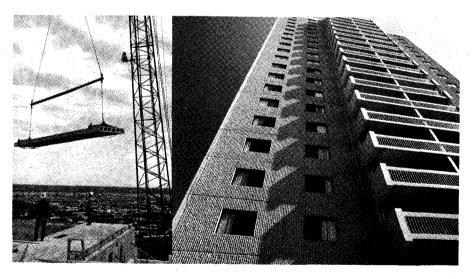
Phillips Tower, Minneapolis, Minnesota. This ten-story building for the elderly consists of 328—8 x 24 to 26-ft x 8-in. solid precast wall panels; 316—8 x 42-ft x 12-in. precast hollow-core floor slabs; $54-4 \times 42$ -ft x 8-in. solid raked precast spandrels; and $21-4 \times 8$ -ft x 4-in. precast hollow-core floor panels. (Note: 1 ft = 0.305 m; 1 in. = 25.4 mm.)
